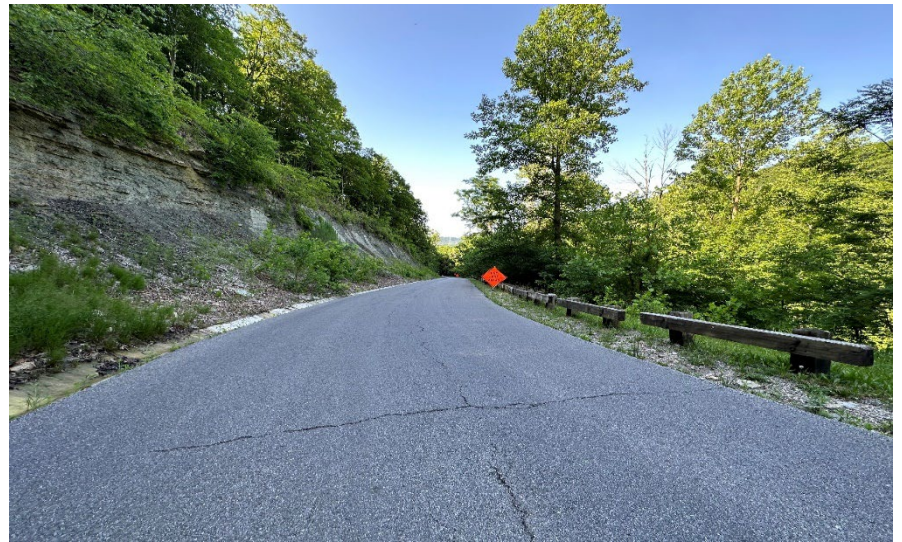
Facing south toward the RSD and Park Road east of the bridge.
